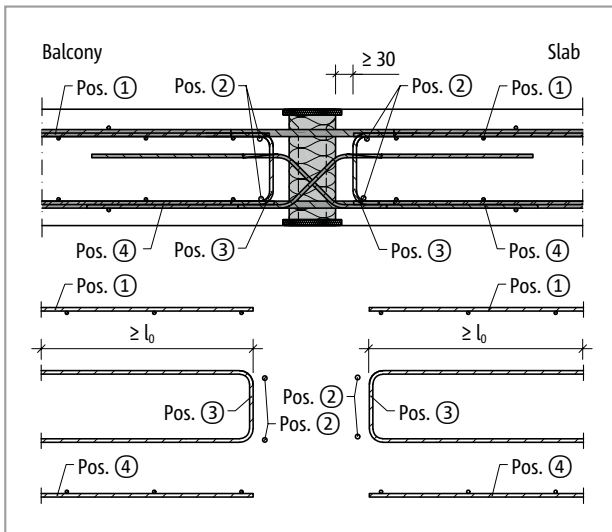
Schöck Isokorb® T type D: On-site reinforcement
